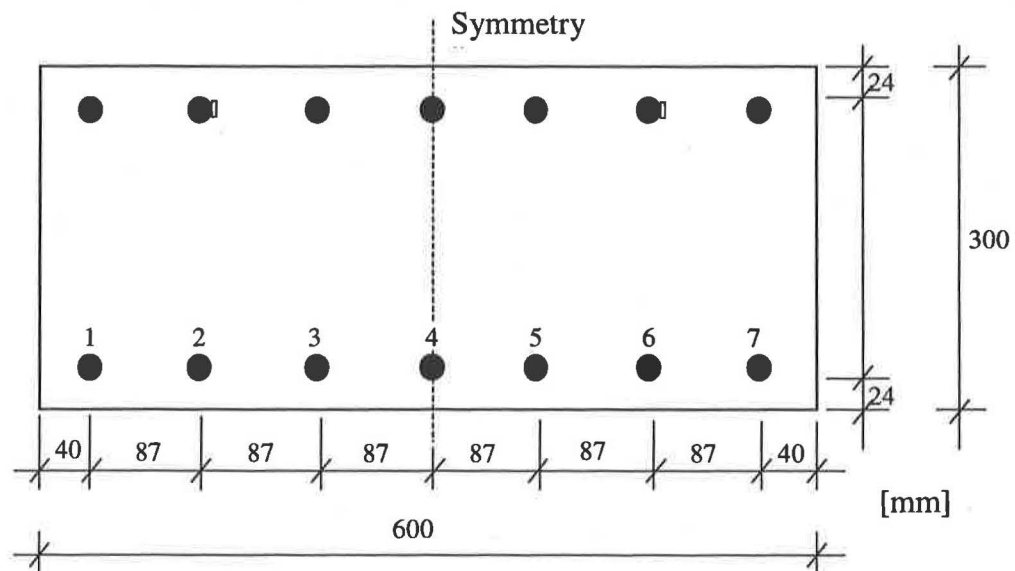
Reinforcement detailing of specimen RV15 (transverse section A-A).
